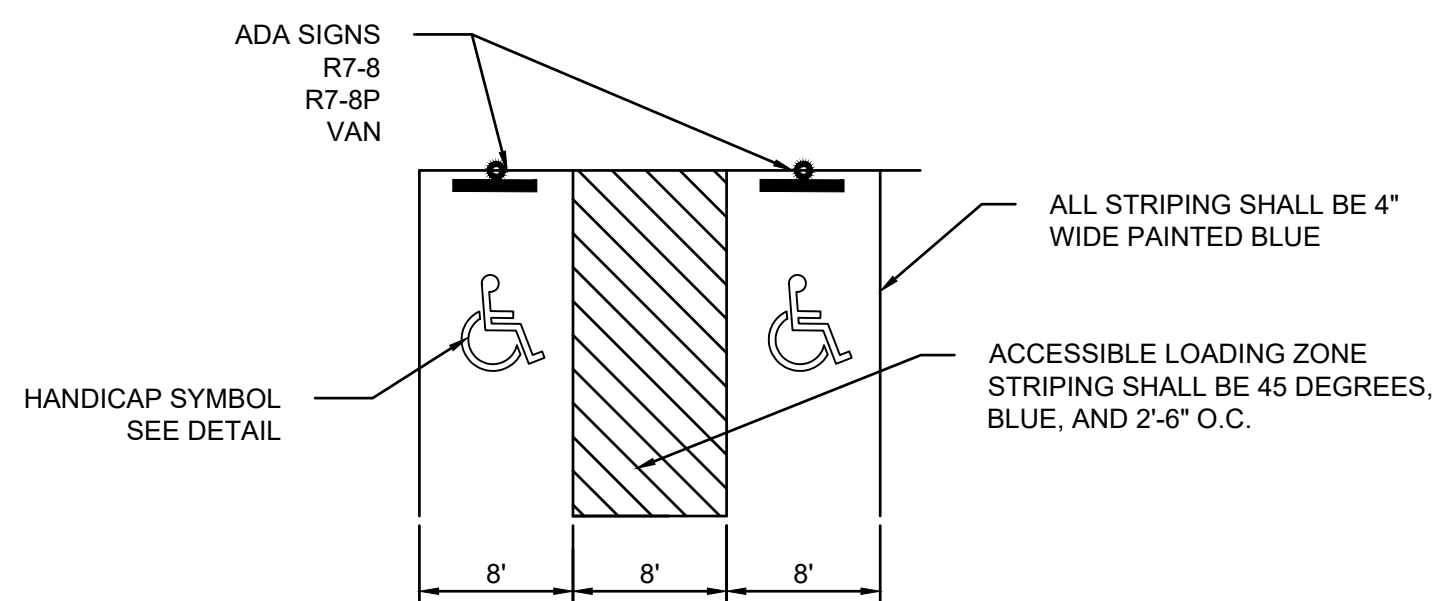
DETAIL AT HANDICAPPED ACCESS ADJACENT TO PARKING
